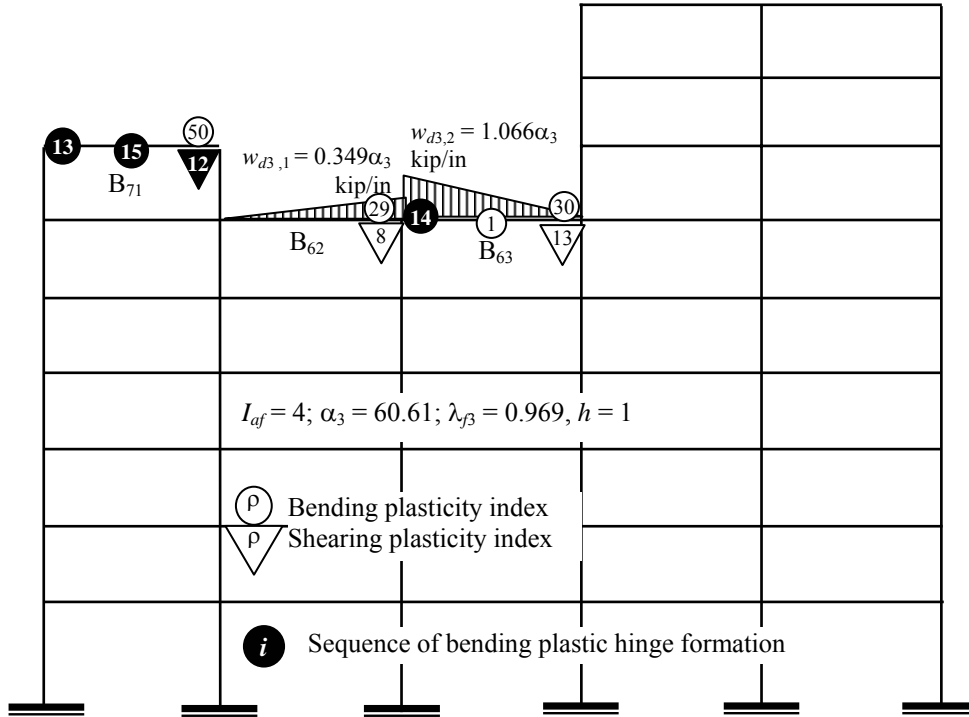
Example 2 (Los Angeles): Beam B_{73} falls as debris loading and fails beam B_{71} (Stage 3)
